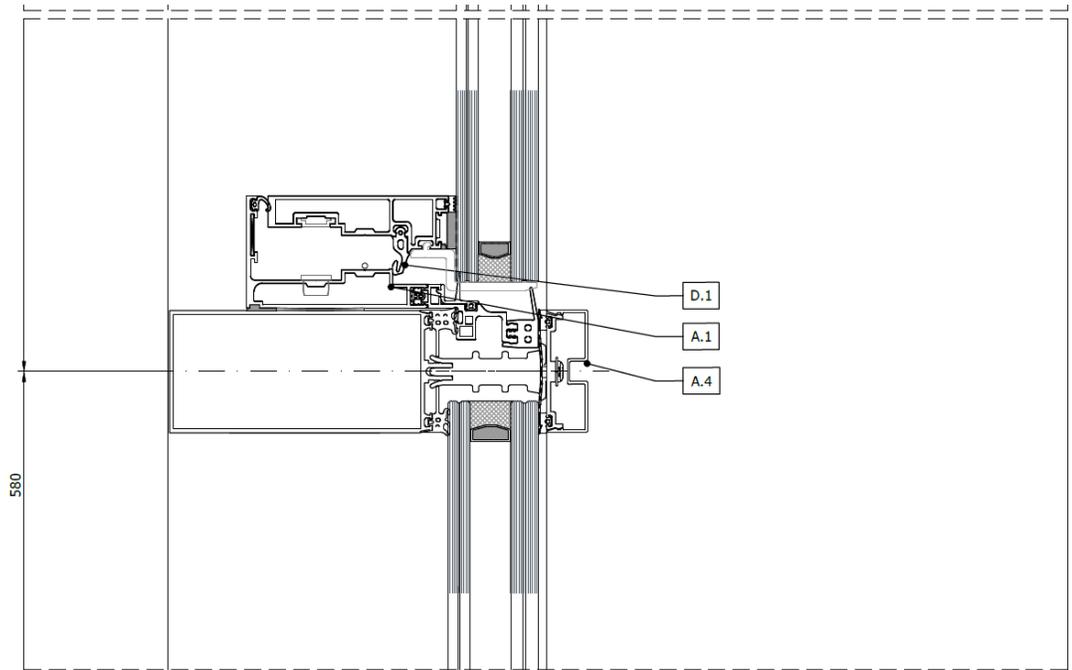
East Elevation WT-1C façade module typical Section Detail 2. Source: Author
